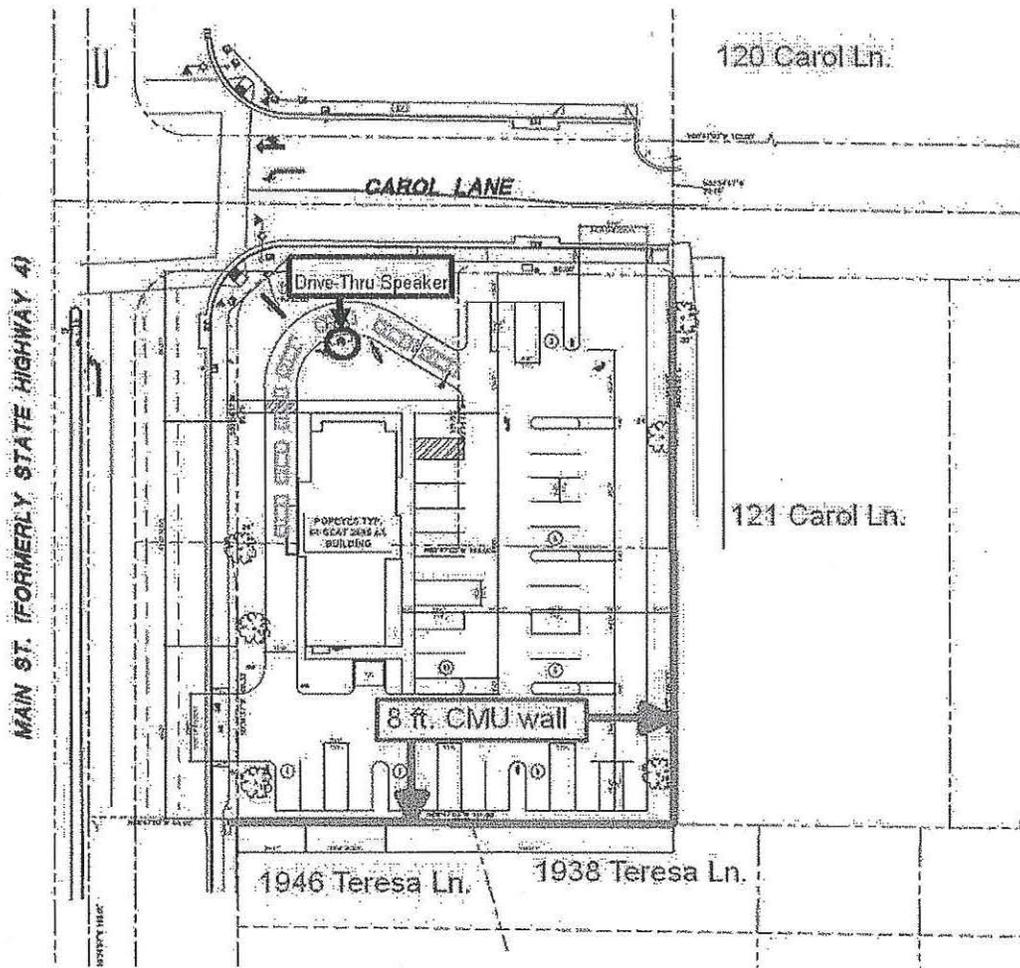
Project Site Plan with CMU wall and Residential Receptors Identified
